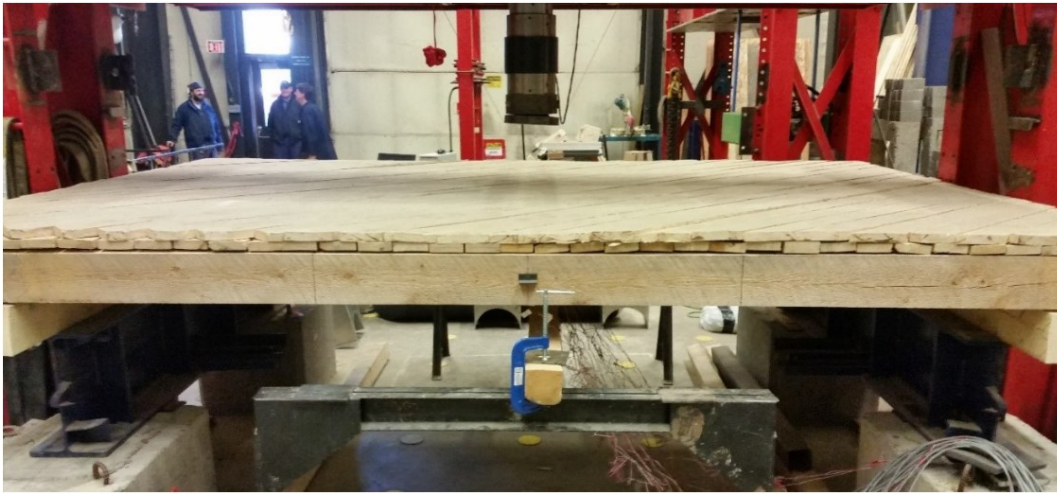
Constructed third scale bridge tested by Smith 2018
